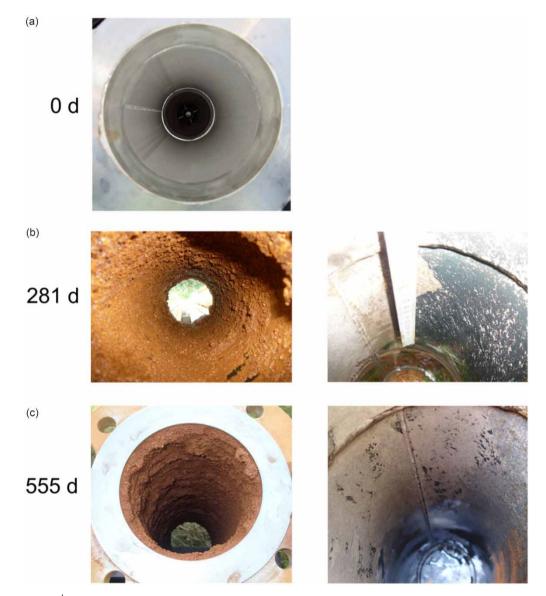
Riser pipe of Well 7 (silver coating): (a) initial, fresh coating, (b) first inspection after 281 days, left: iron oxide incrustations on inside, right: inside after cleaning, (c) second inspection after 274 further days, left: incrustations on inside, right: inside after cleaning (photographs: Houben, Sander).
